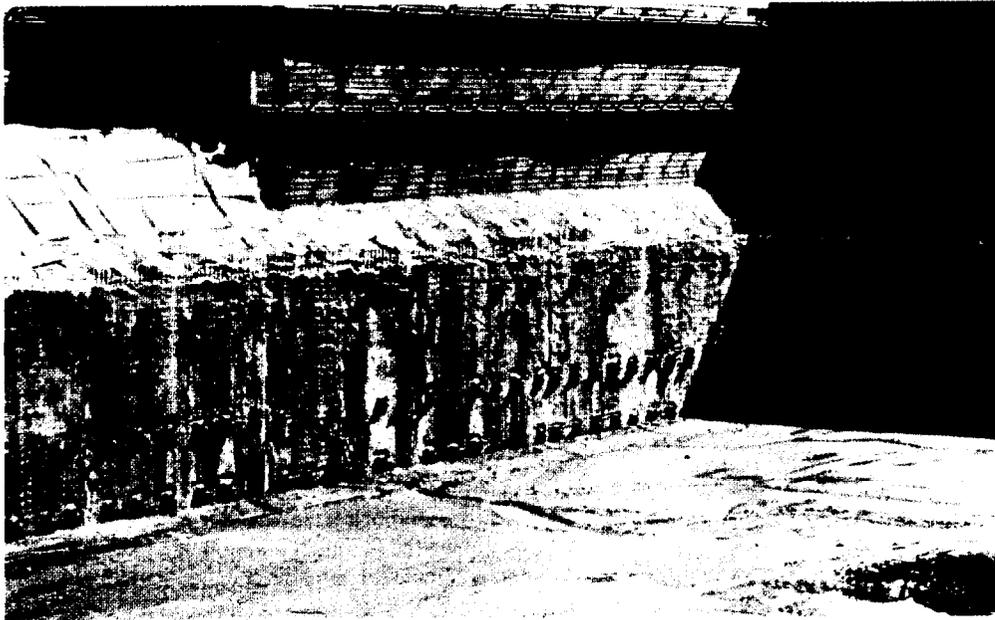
Upper wall of soldier piles and wooden lagging braced by two layers of tie-backs with steel walers. Lower level of reinforced slurry wall construction with multiple levels of tie-backs.
